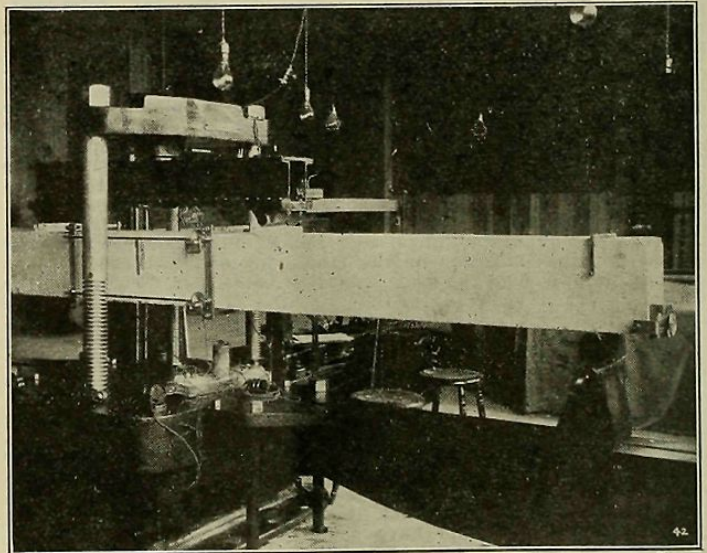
TESTING A 13-FOOT CONCRETE BEAM.
